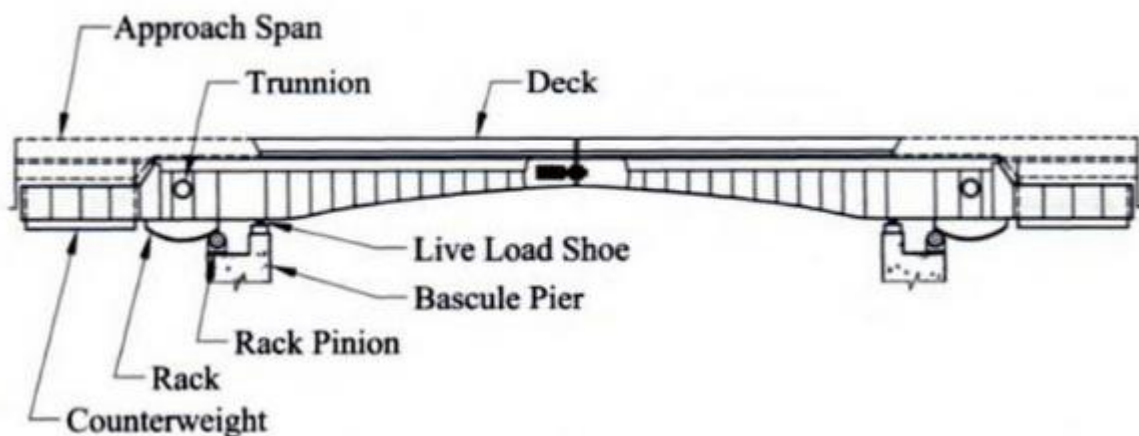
Typical Bascule Bridge – Trunnion type (Koglin, 2003)
